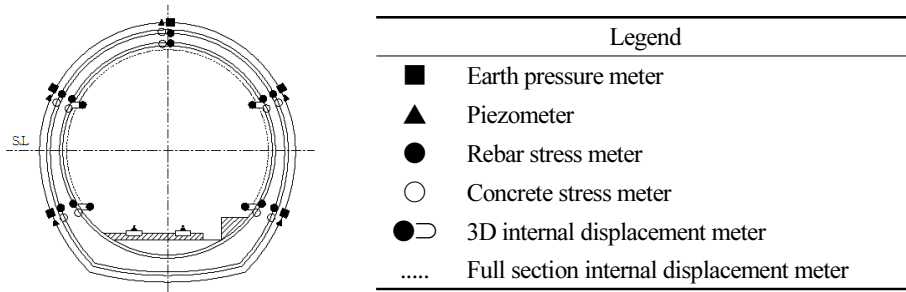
Example of arrangement of maintenance monitoring in tunnel structure
